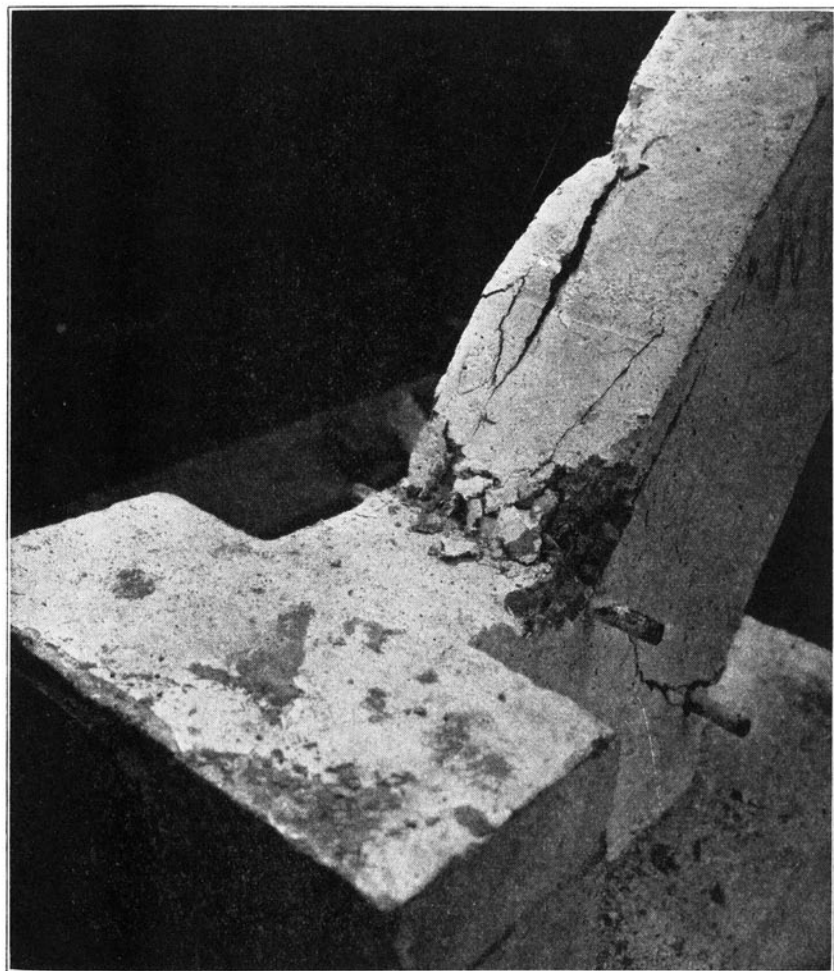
FAILURE OF ARCH 26-7 AT NORTH SPRINGING DUE TO
